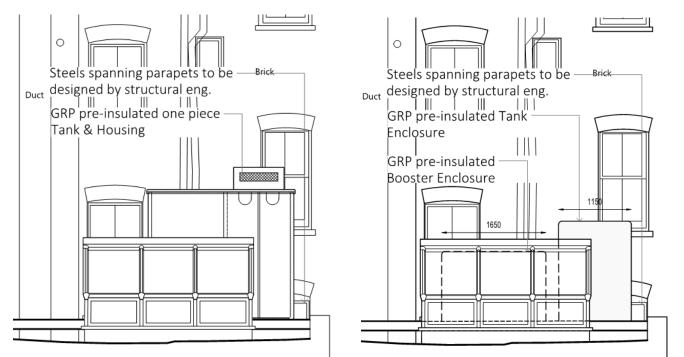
Figure A: Original & revised design respectively in context of rear façade of 10 Charlotte Street with the existing lantern in the foreground.
